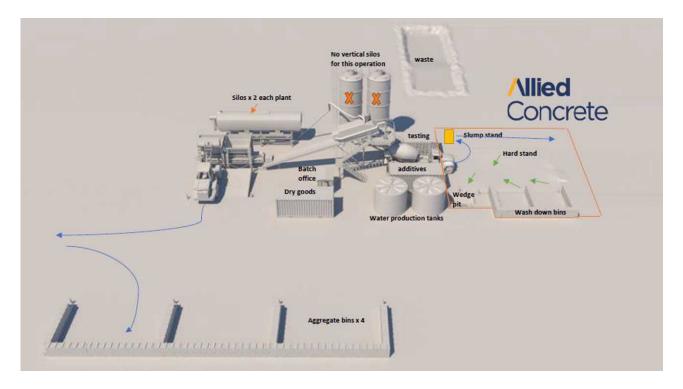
Indicative Concrete Batching Plant Layout (Note: project will require be two plants.) Orange lines indicate bund to separate wash down area and the rest of the CBP area.
